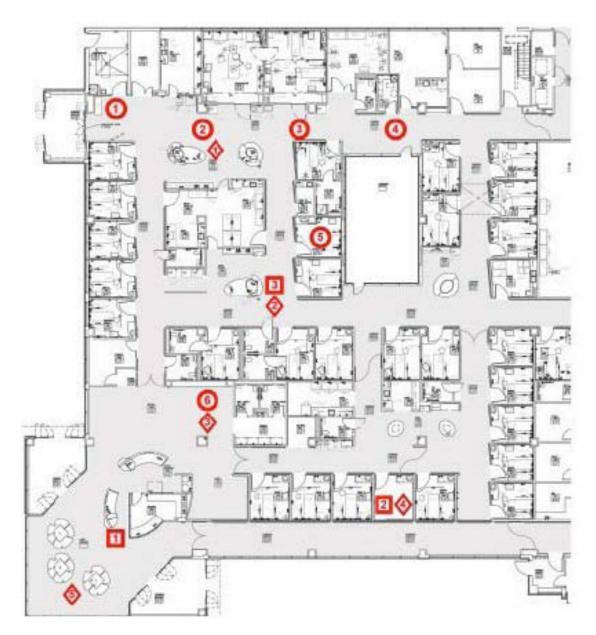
Floor Plan and Measurement Locations for Hospital 3
